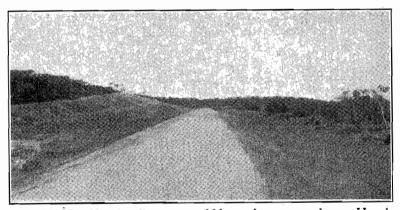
Showing limestone rubble road constructed near Hattah.
